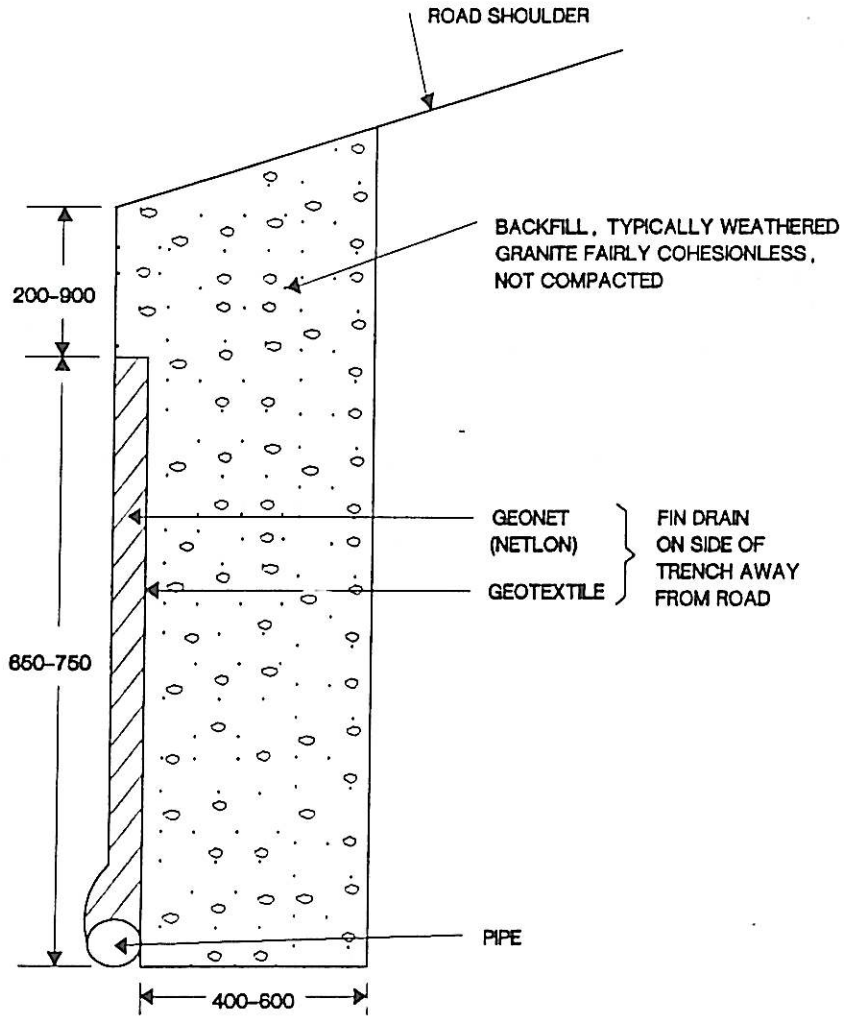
TYPICAL SIDE DRAIN : N4-7 , ROAD 1657 , ROAD 725
